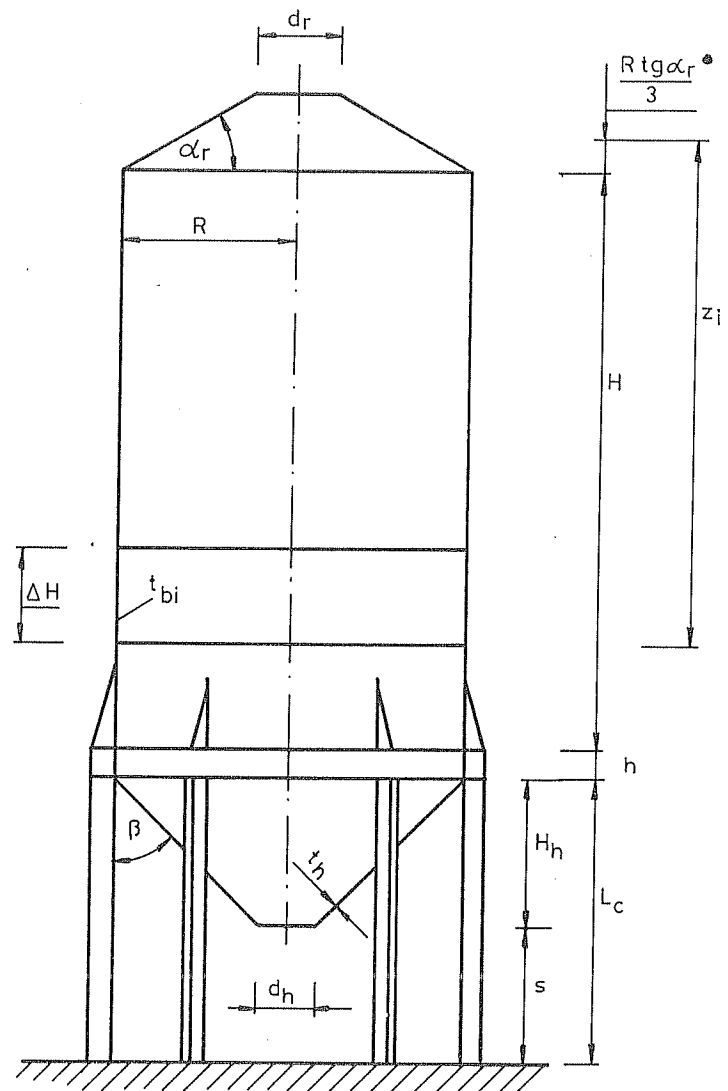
Main dimensions of a welded steel silo
